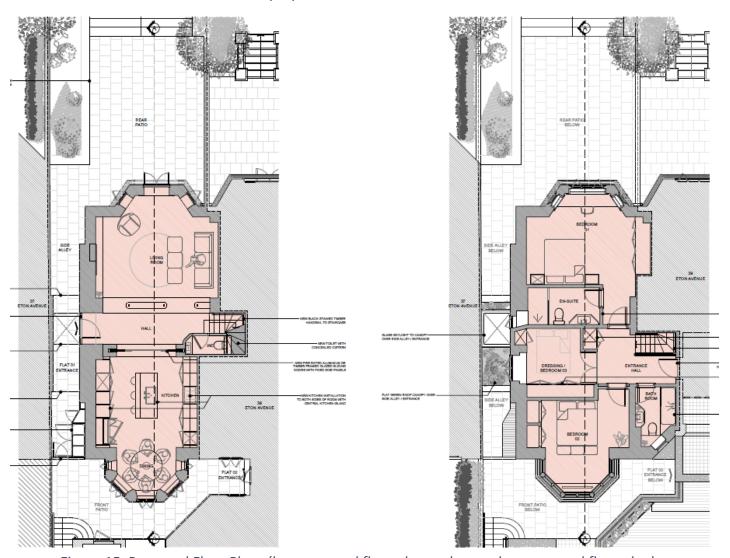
Proposed Floor Plans (lower ground floor plan and upper lower ground floor plan).
